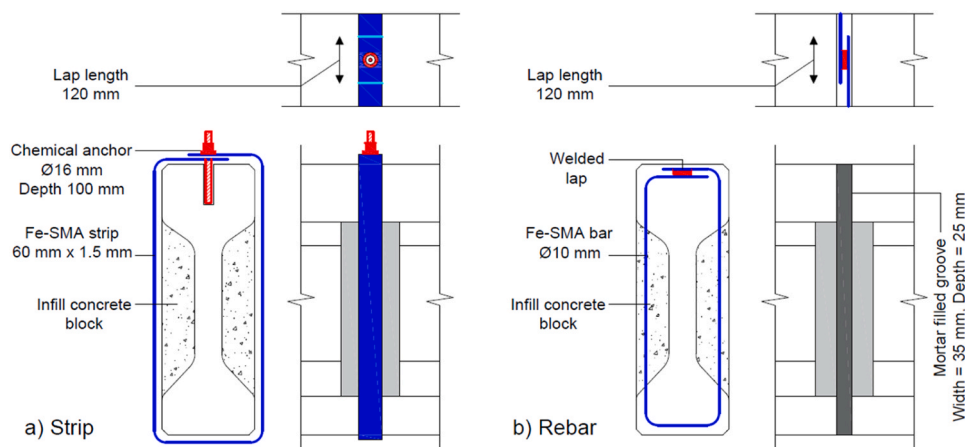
Fe-SMA shear strengthening configurations using a) strip and b) rebar.
